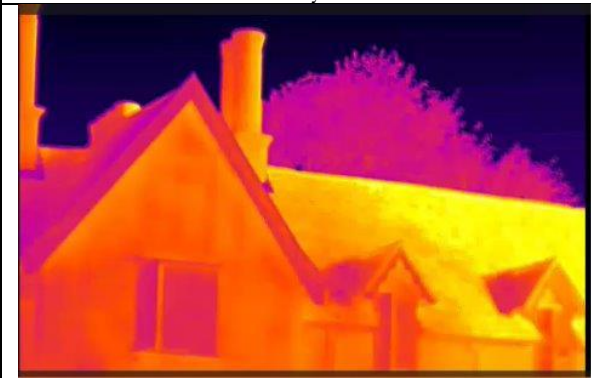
Thermal imaging viewpoint 15/06/23 of the mid-section of the northern elevation.
